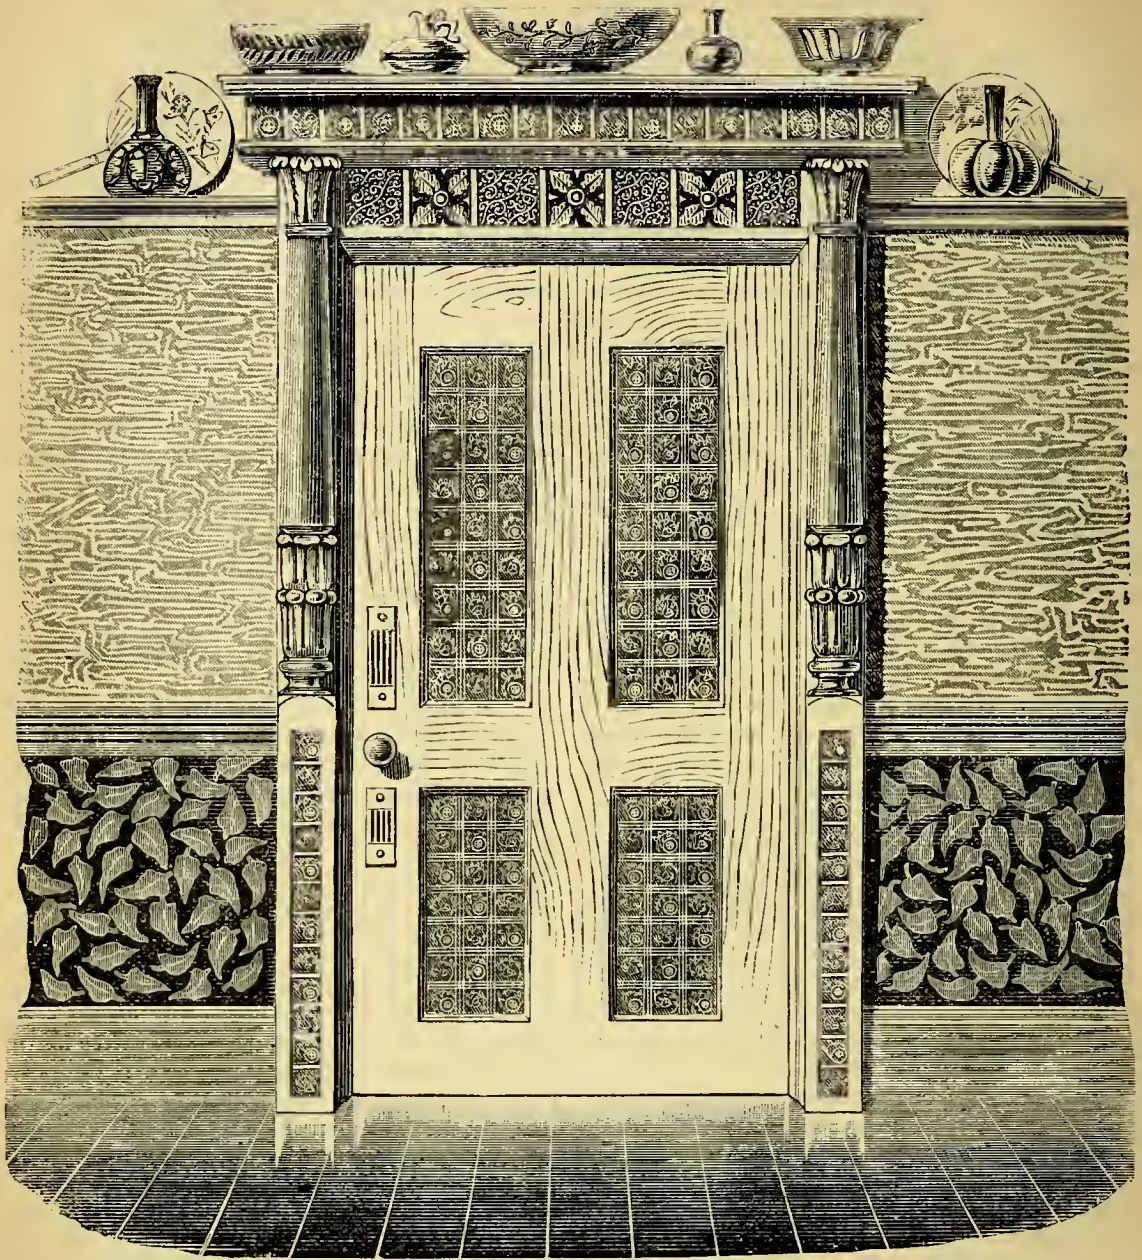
OVERDOOR FOR DRAWING ROOM, SUPPORTED ON PILLARS ADAPTED FROM BED-POSTS.
